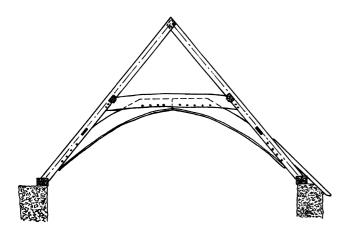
East Mersea, St Edmund, typical north aisle roof, looking west.
